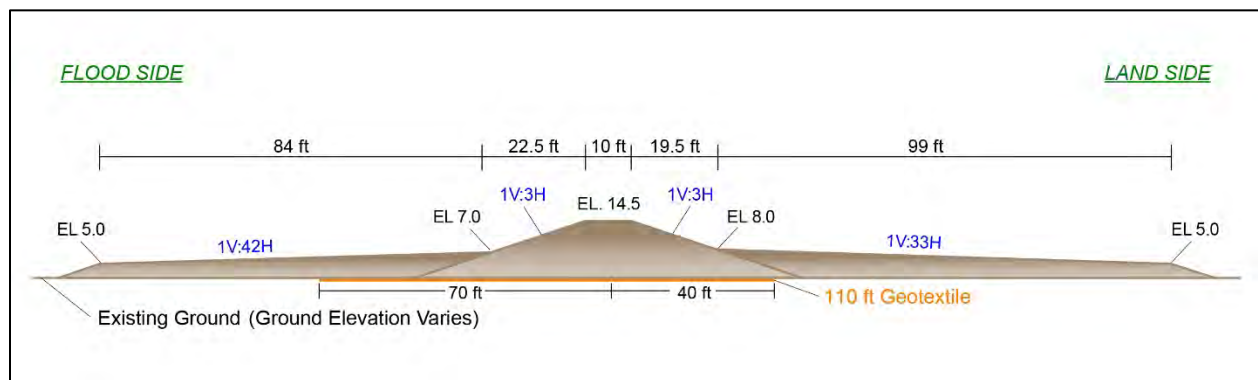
Typical Cross-Section with Berms for West Slidell
